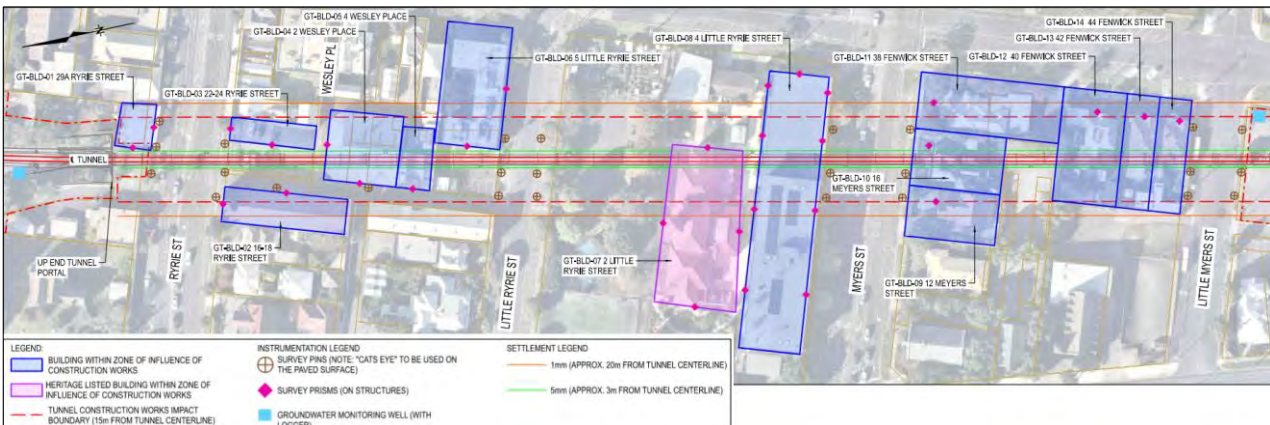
AERIAL PHOTO SHOWING THE LOCATION OF BUILDINGS INSTALLED WITH MONITORING DEVICES WITHIN THE ZONE OF INFLUENCE OF TUNNEL CONSTRUCTION WORKS. (SOURCE: AURECON/VLINE)
